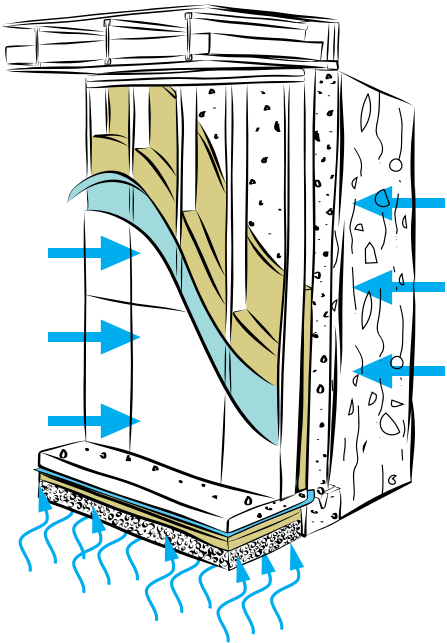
Typical water vapor loads on below-grade walls and slabs-on-grade
